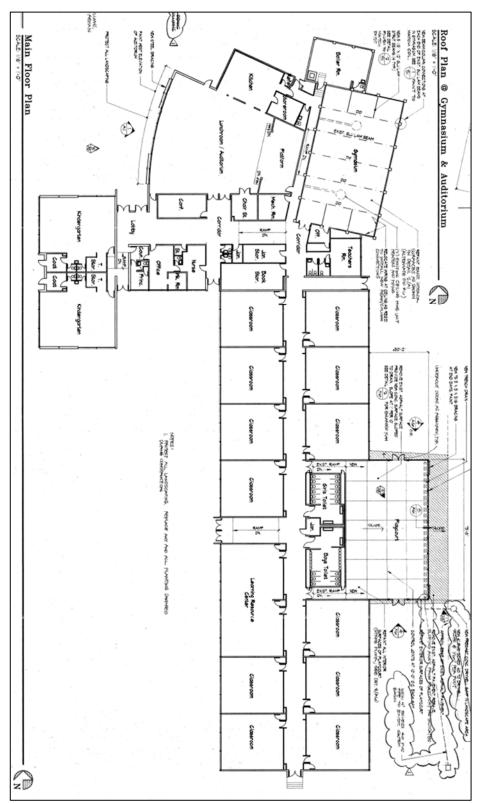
Diagrammatic plan of John Rogers Elementary School. The plan shows the entire building in one drawing, something not available in the original 1956 plans. (from Schreiber & Lane, Architects, "Seismic Hazard Mitigation," Sheet A1, 1993)
